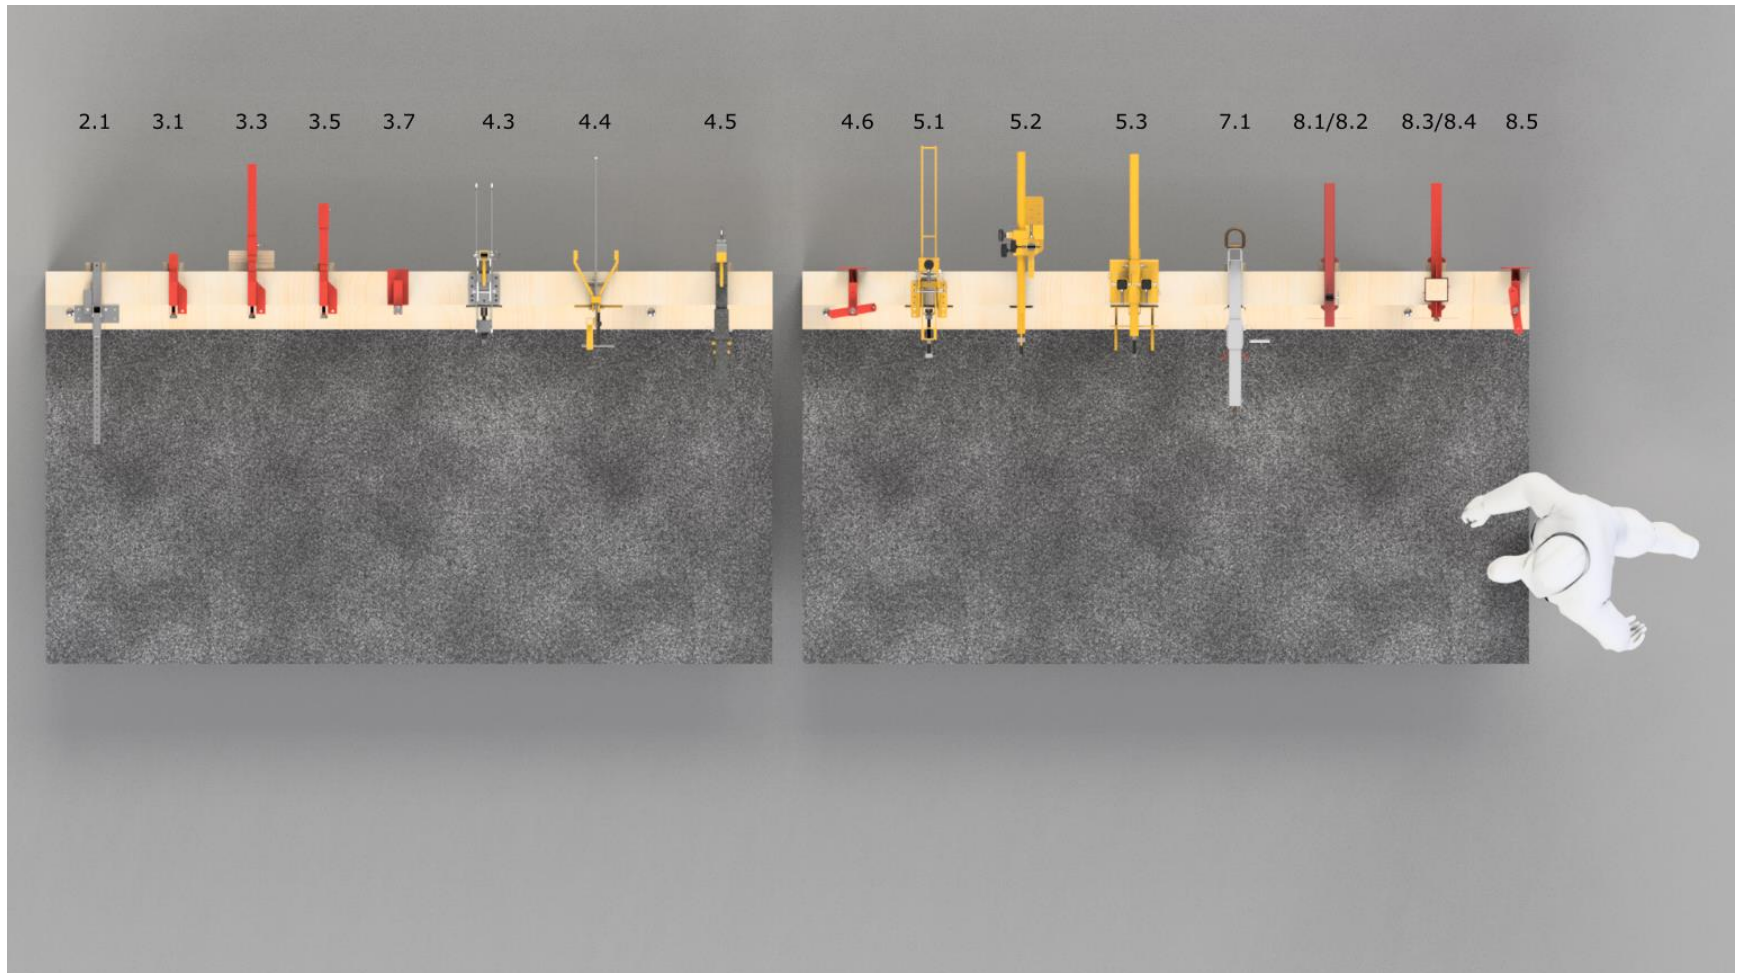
Guardrail Type 22, guardrail fit; view from the top
